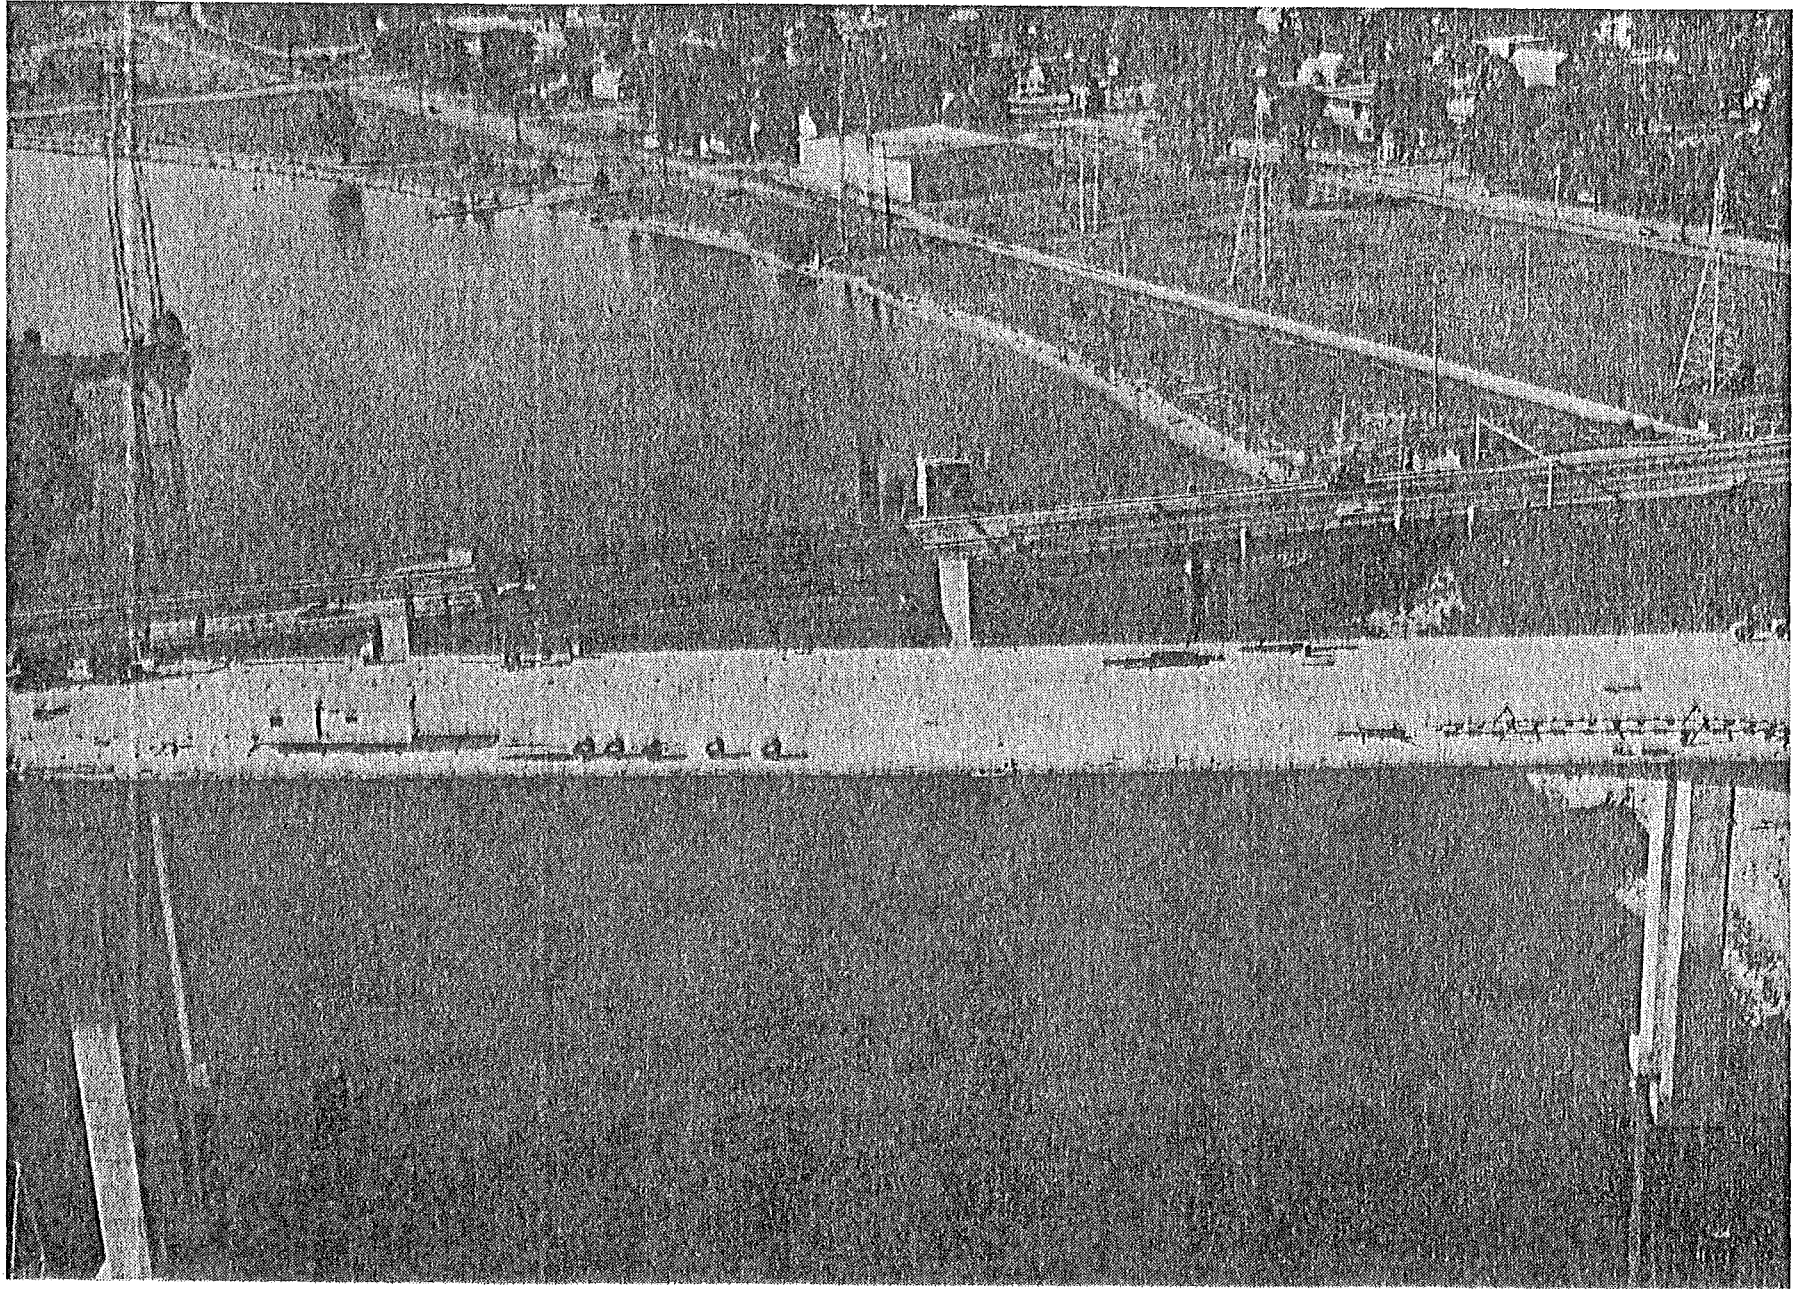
Aerial view of Span 13 (Pier 12N to 13N)
